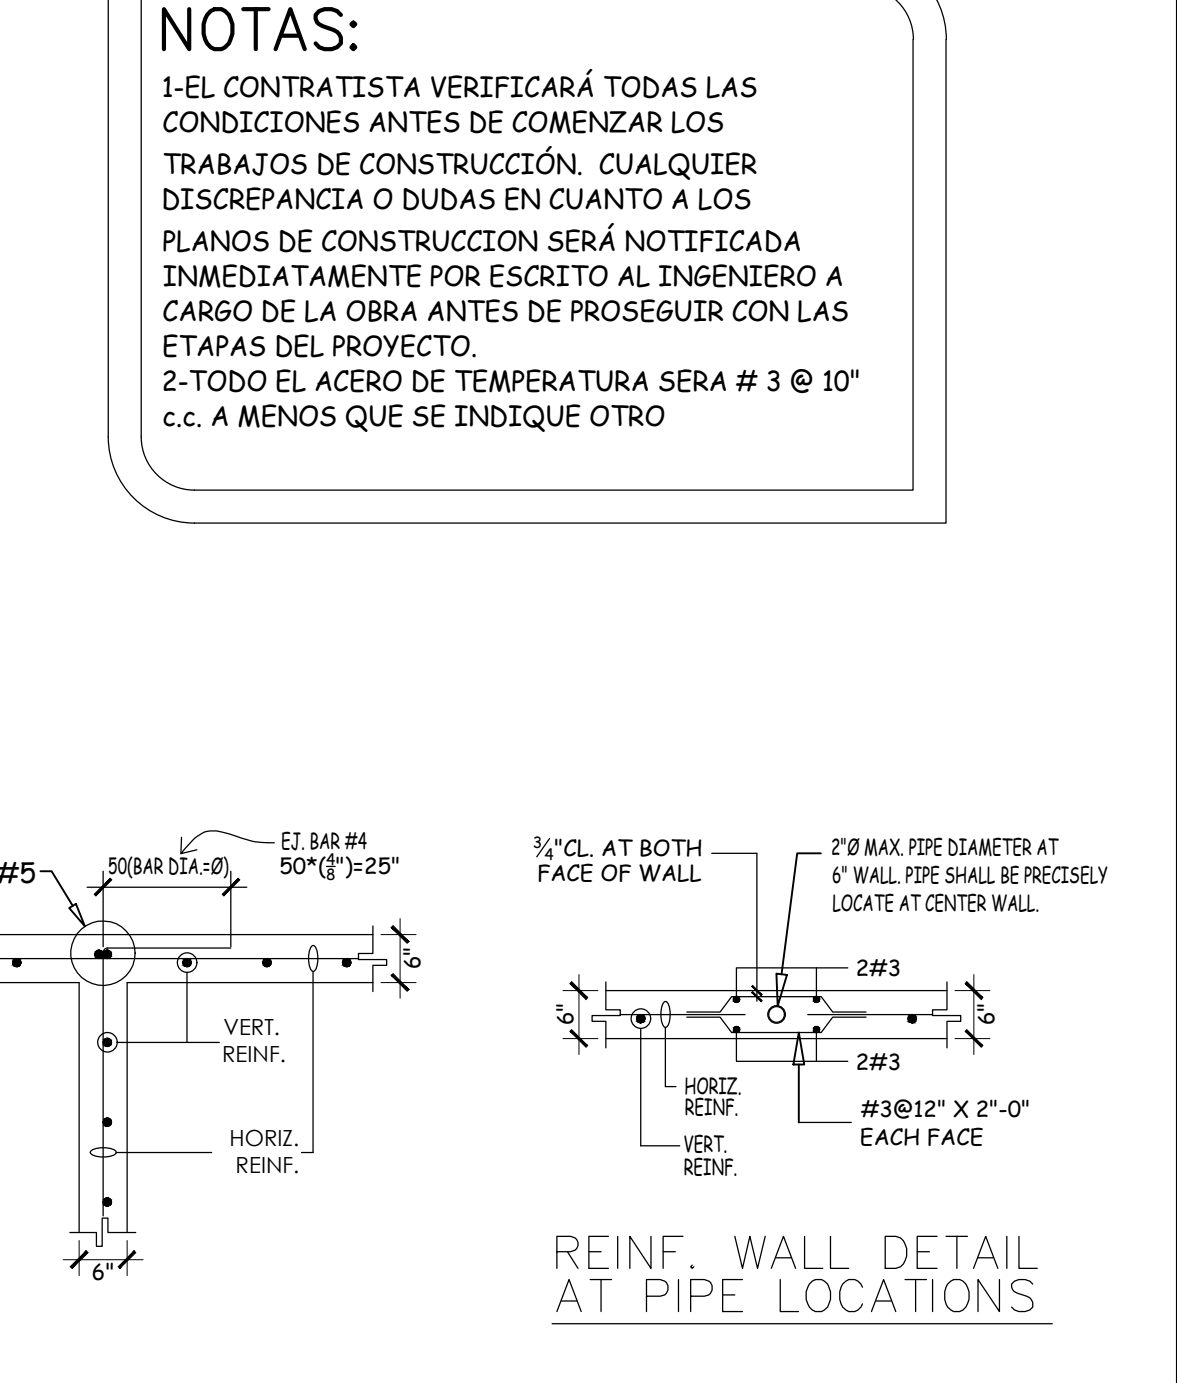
DETAILS OF CONCRETE WALLS REINFORCEMENT SCALE: 1/2"=1'-0"
